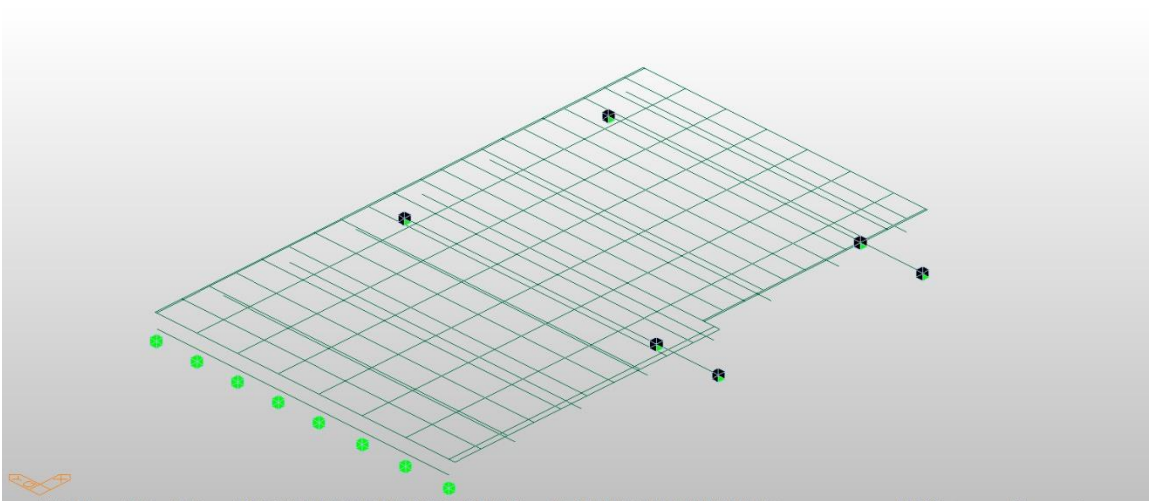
Approach and Tower support conditions for 225mm Concrete and 90mm Asphalt (Similar to North Tower)
